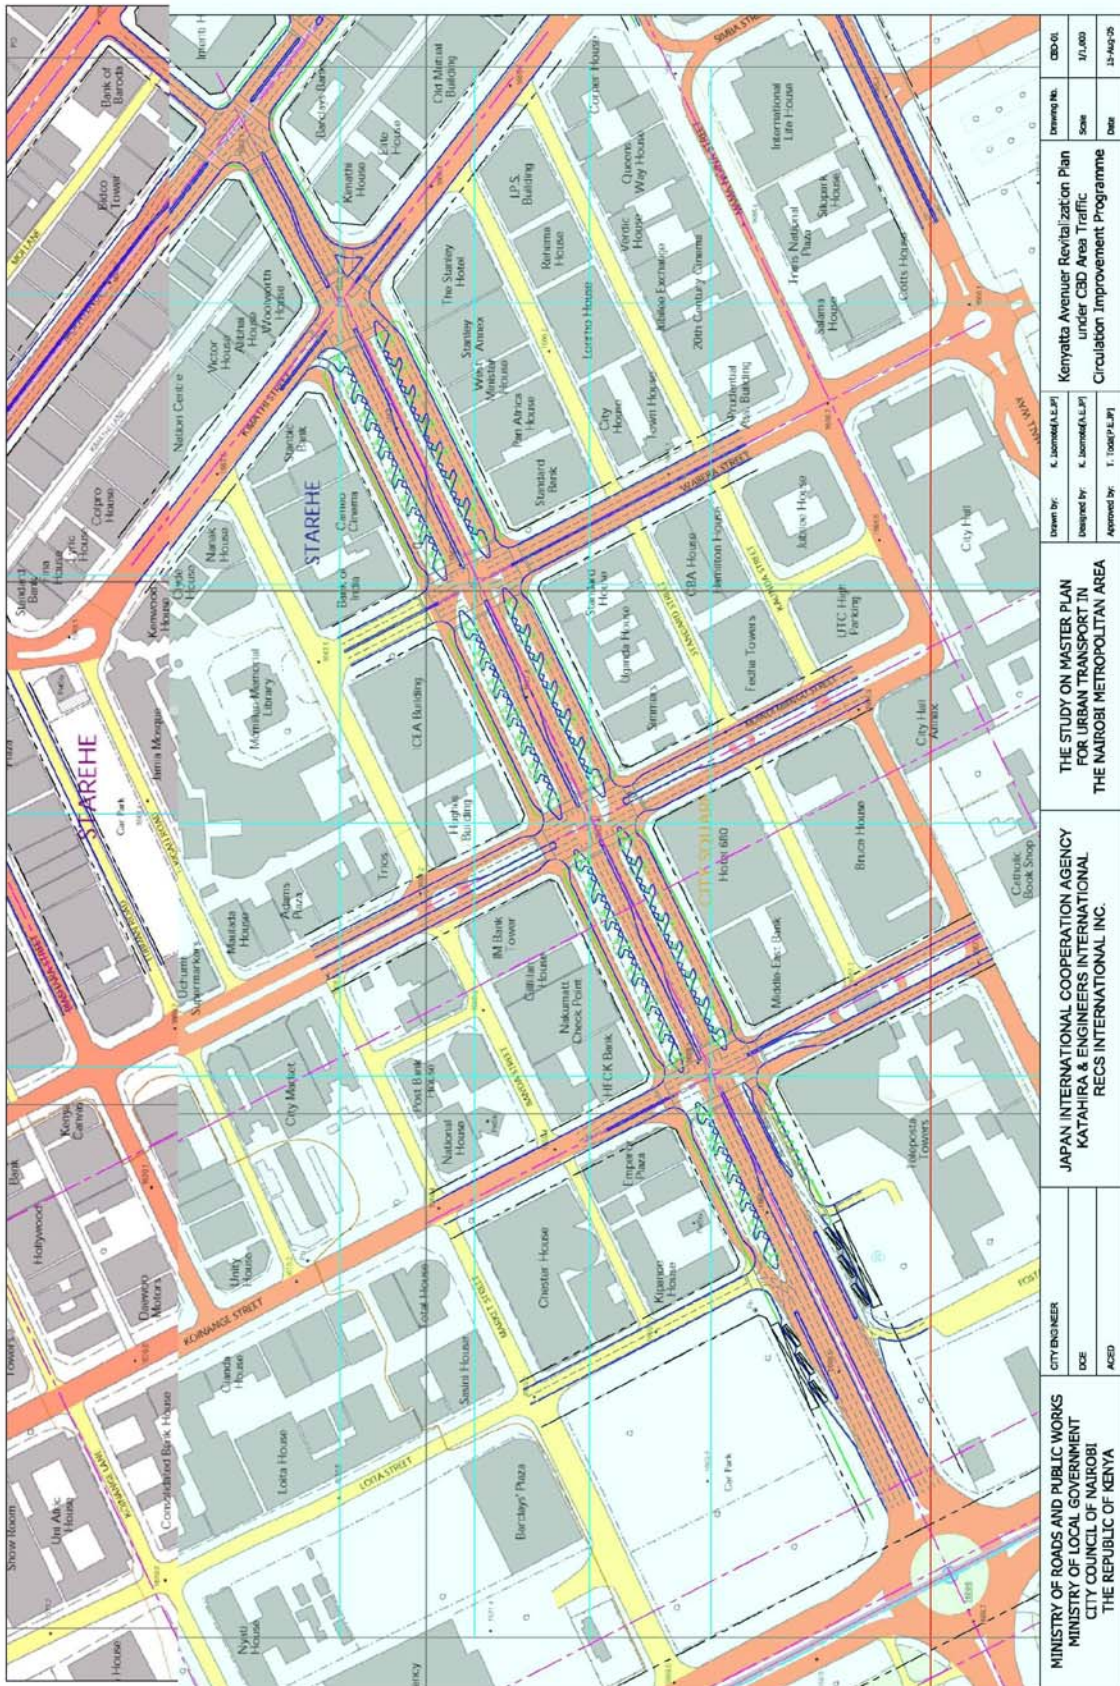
CONCEPTUAL PLAN FOR KENYATTA AVENUE REVITALIZATION
